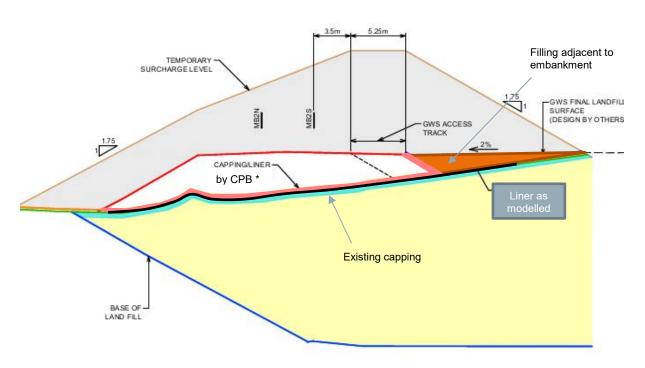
Typical section considered for the Analysis Note: * final GCL layout to be agreed
